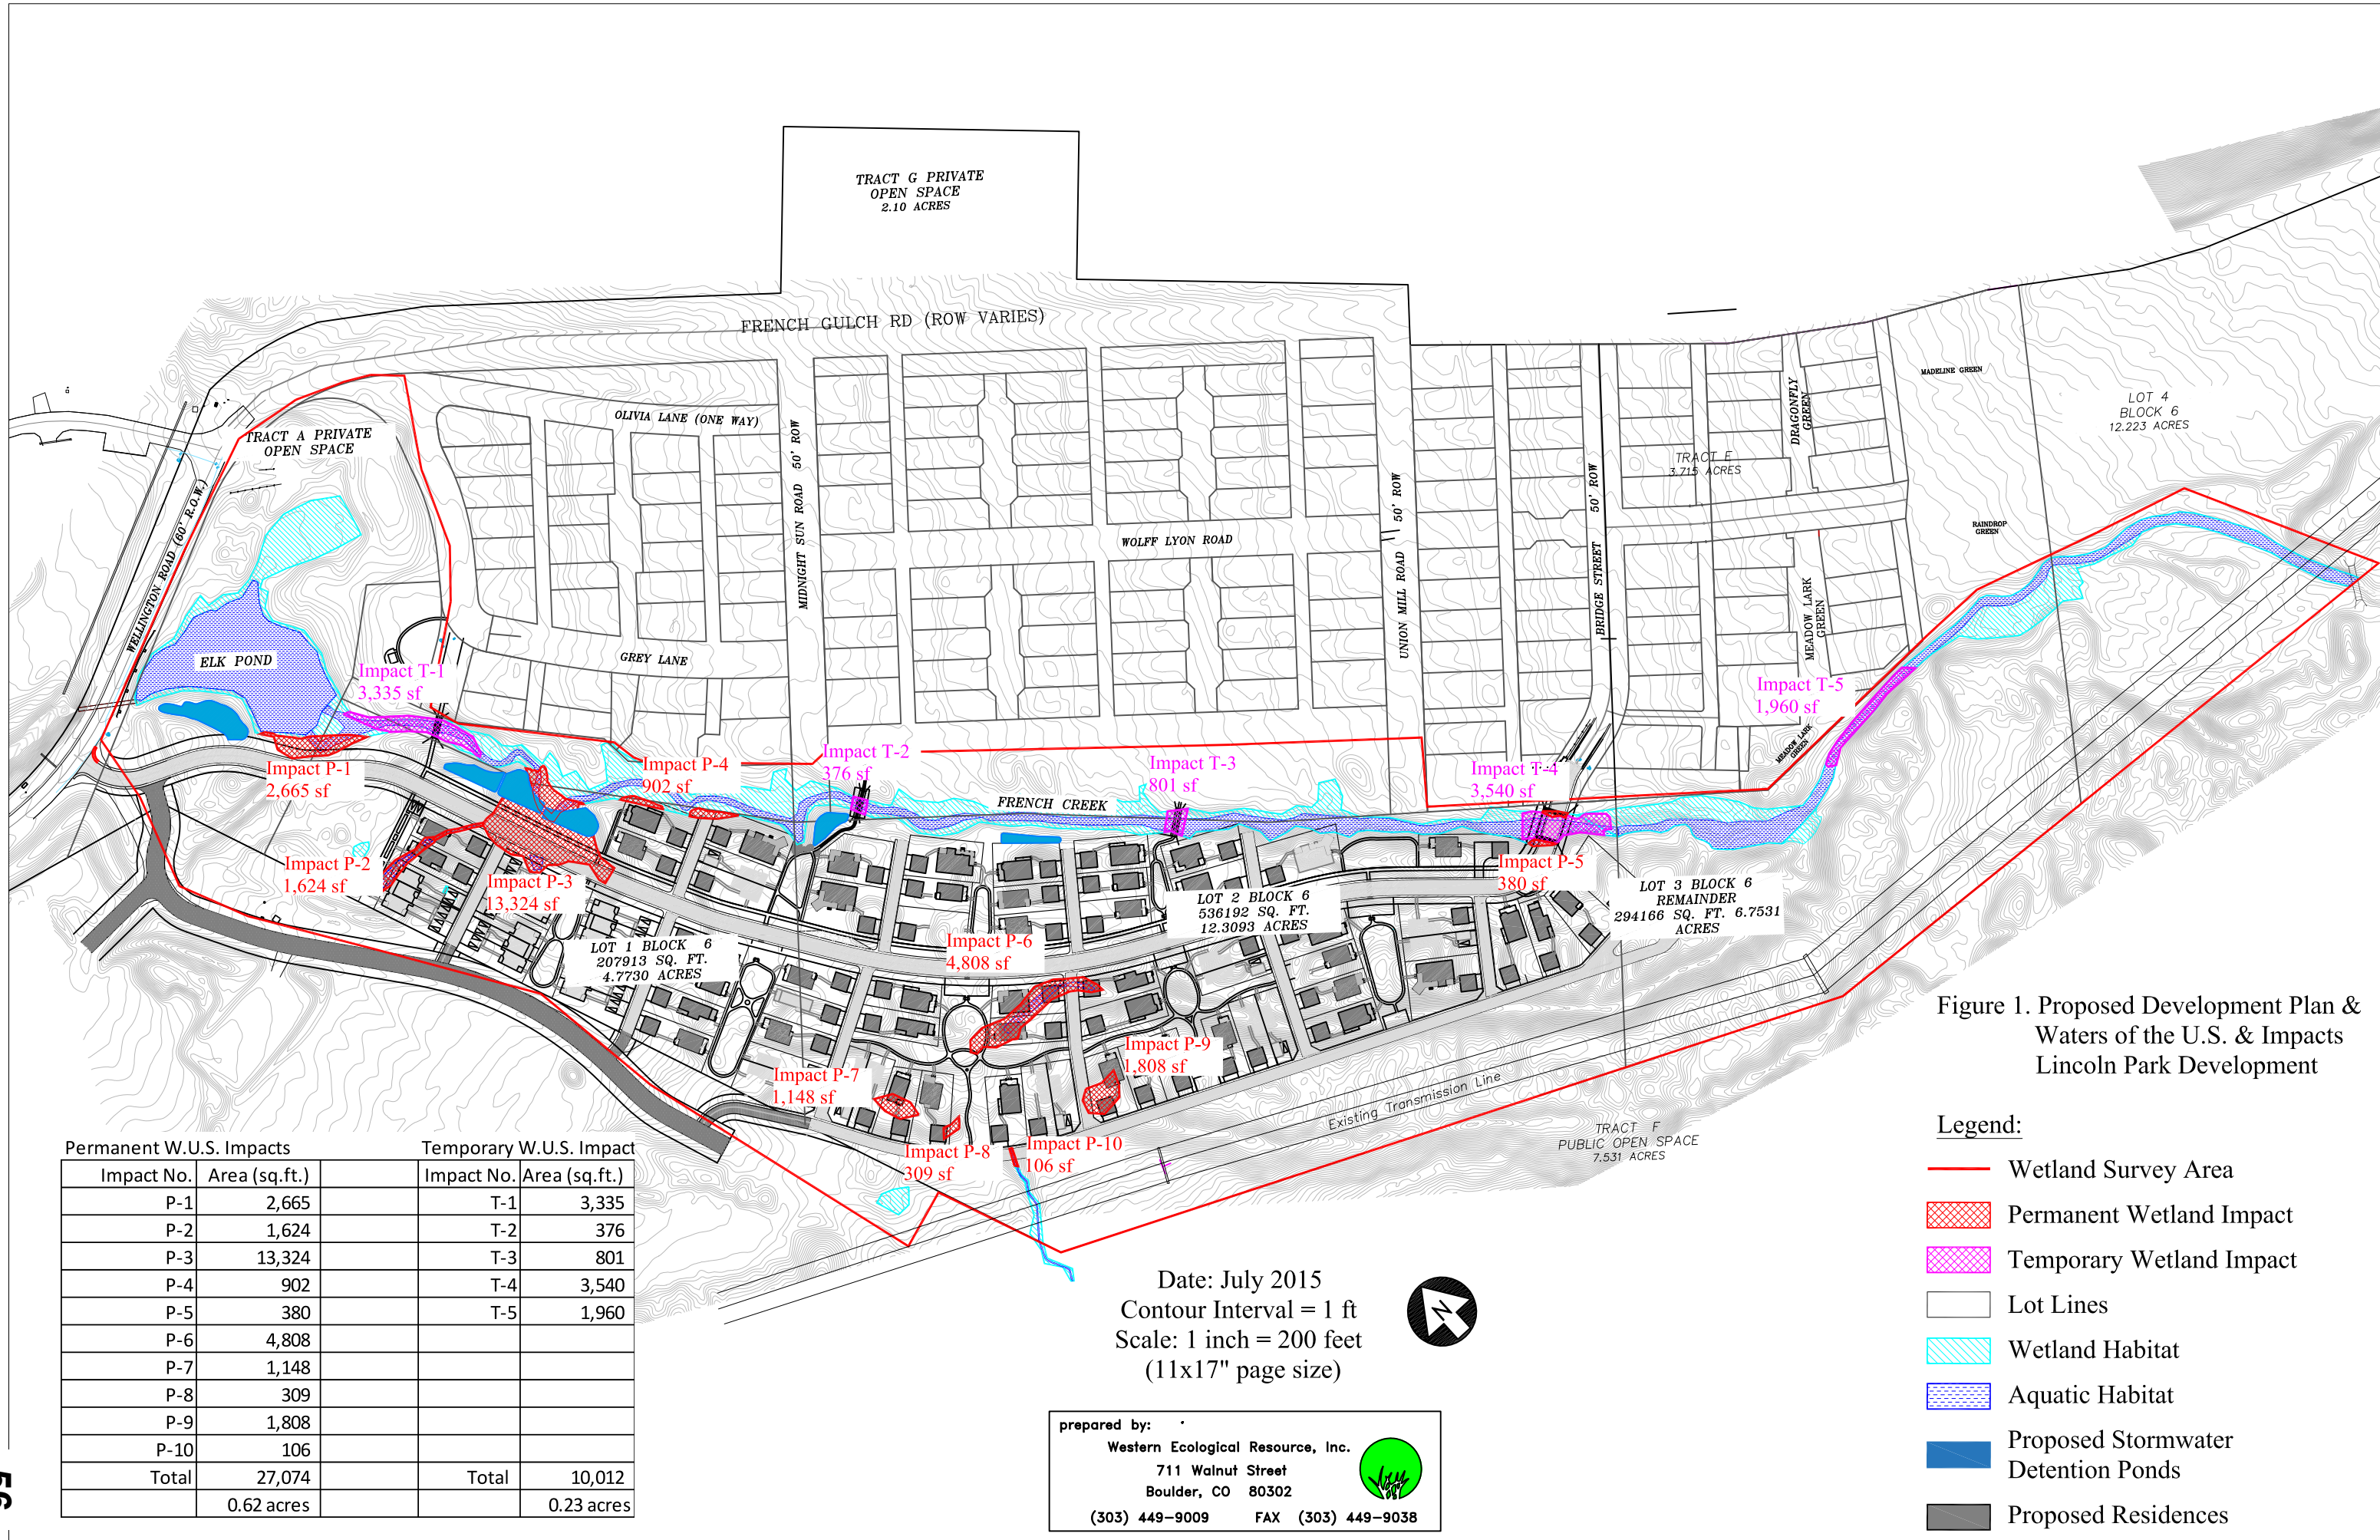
Proposed Development Plan & Waters of the U.S. & Impacts Lincoln Park Development
